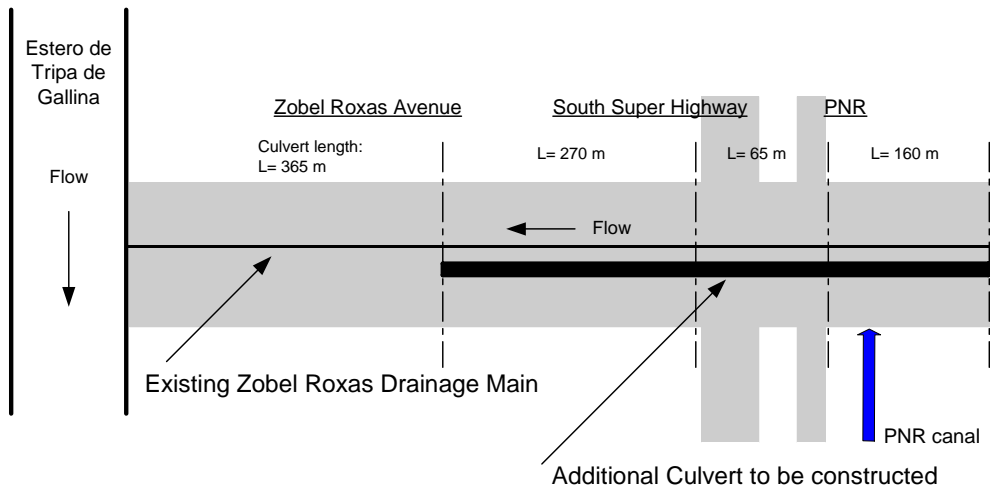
Proposed Route of Additional Culvert in Zobel Roxas Drainage Main
